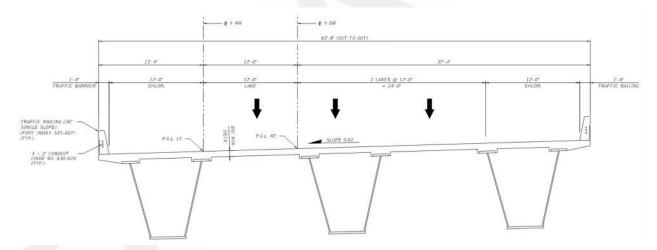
Bridge Typical Section (Bridge No. 10)
